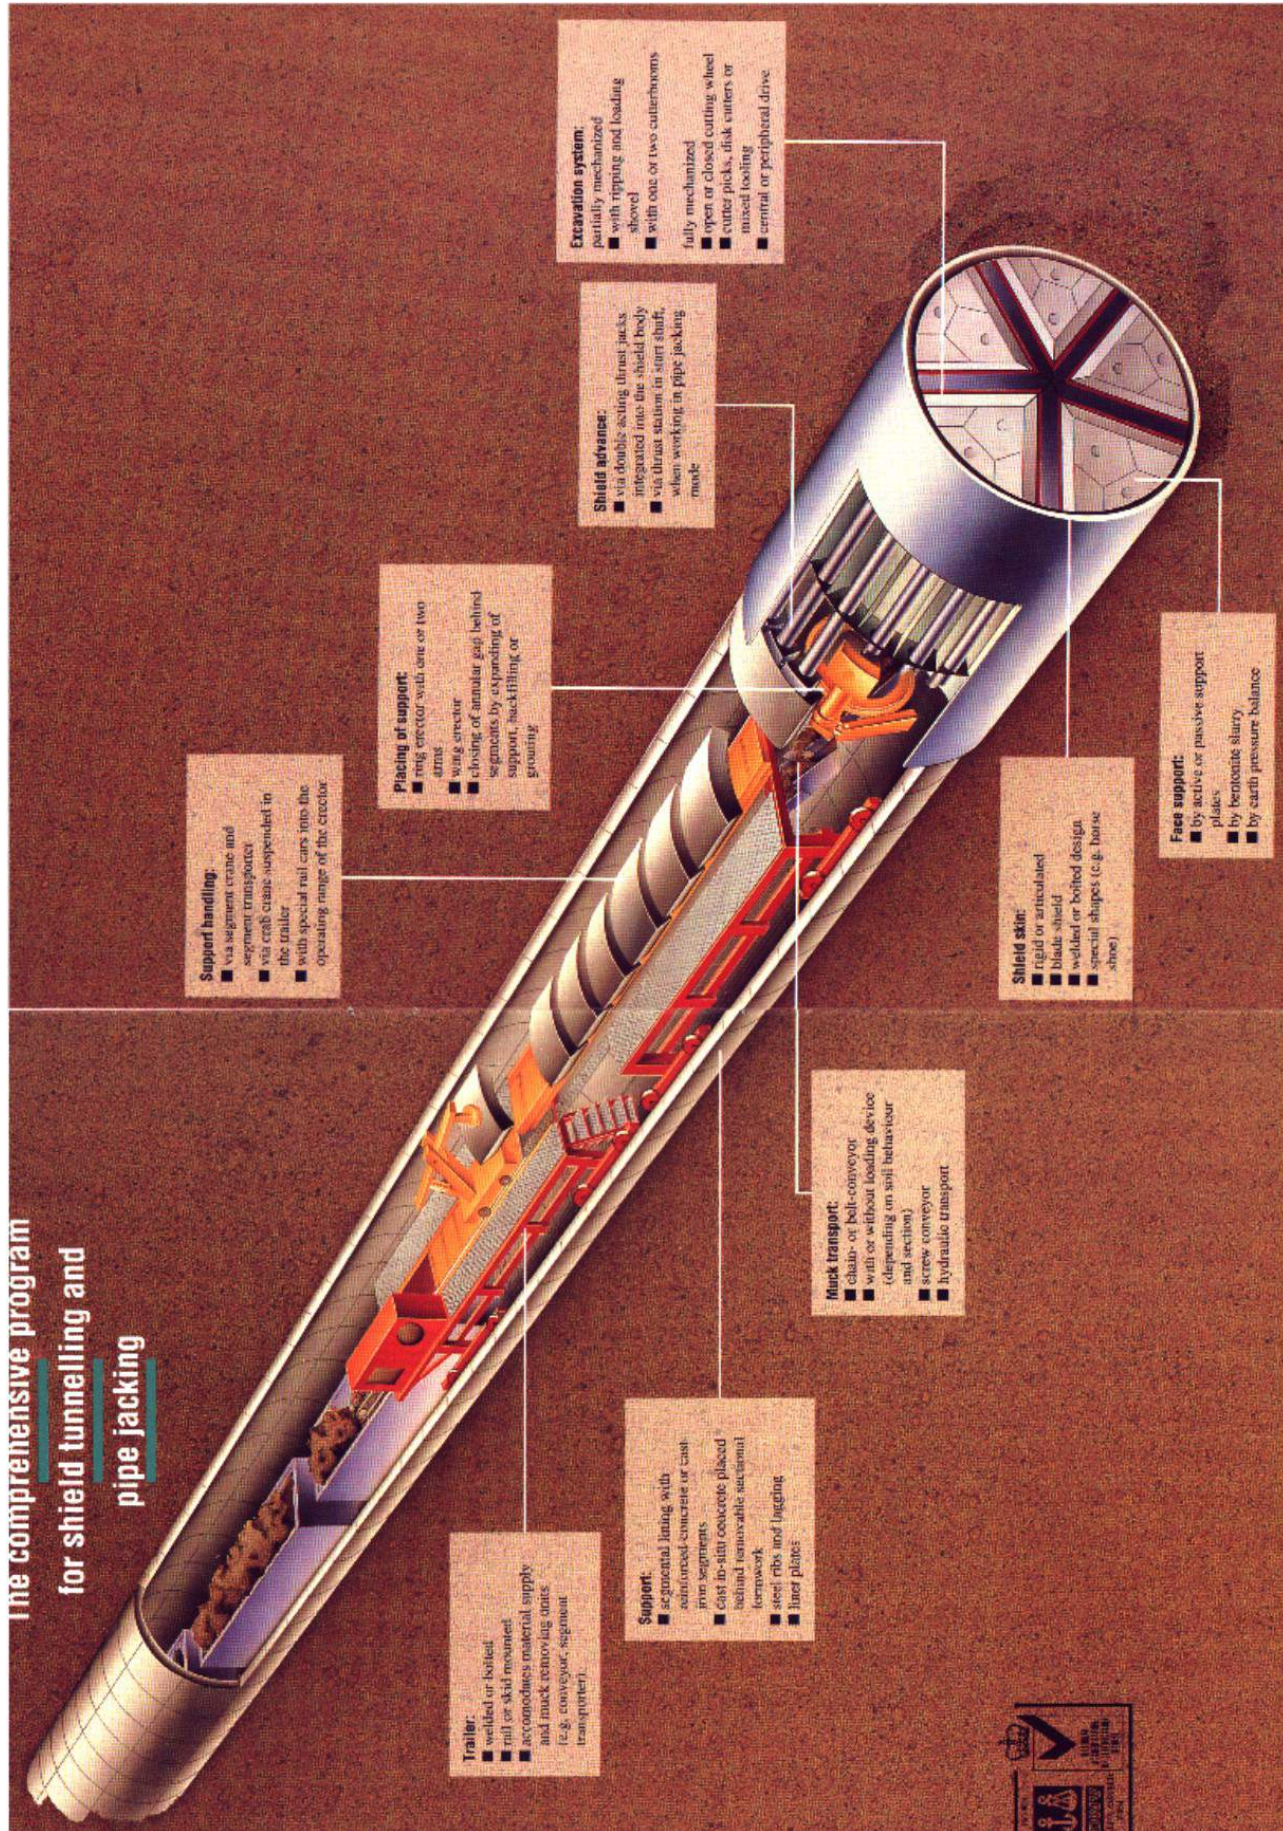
Tunnel Boring Machine (TBM) layout (drawing: Voest-Alpine Bergtechnik)
